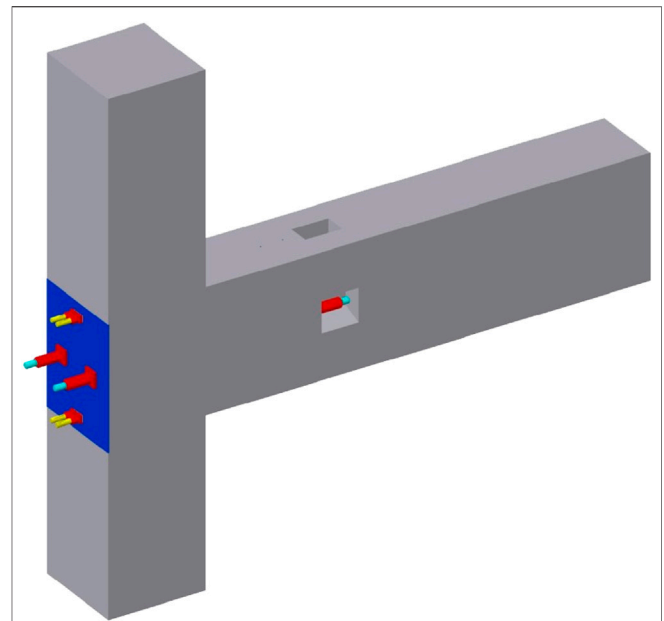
| Connection detail of post-tensioned precast specimen.
